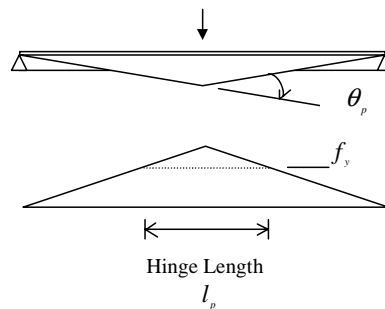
Conditions of an Under-Reinforced Beam at Failure
